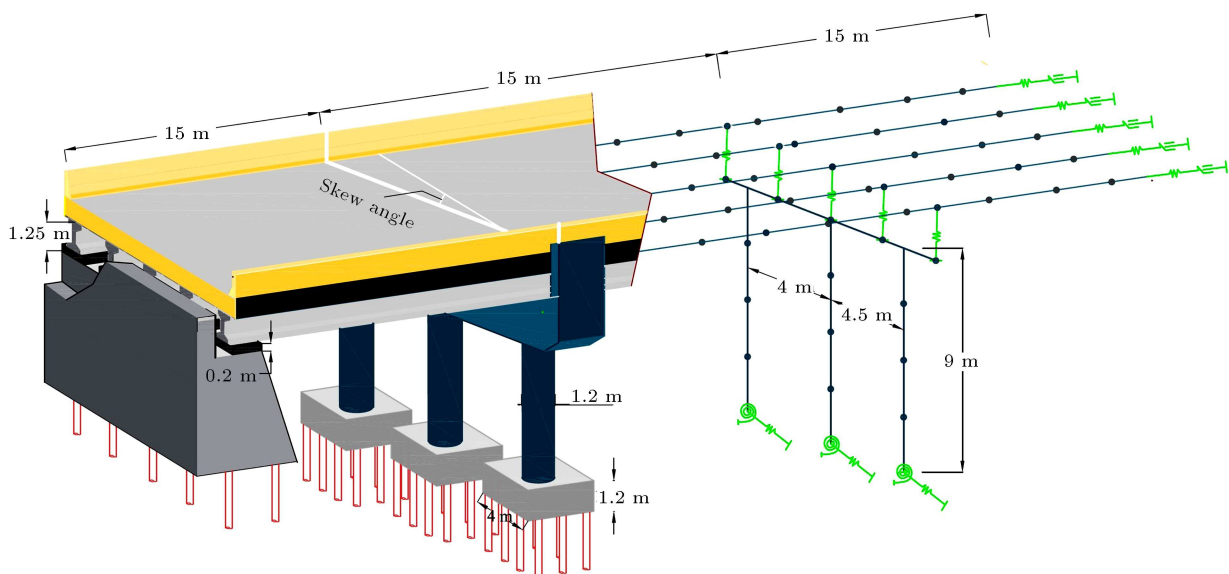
3D view of a typical slab-on-girder concrete skewed bridge model.
